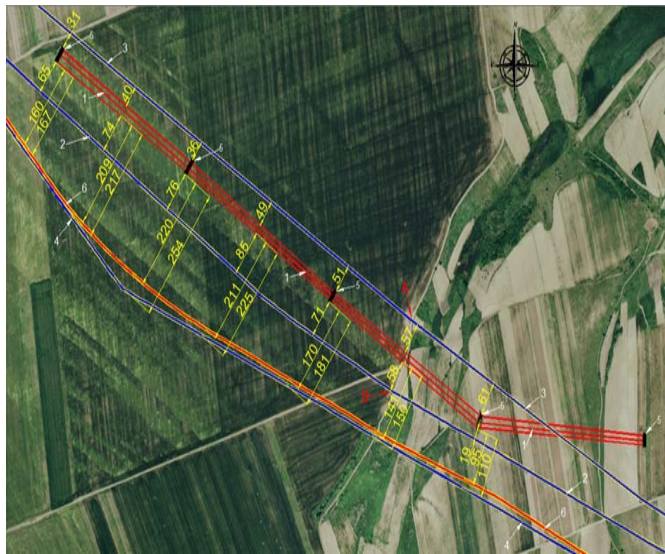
Plan view of the HVPL-MPs common distribution corridor.
